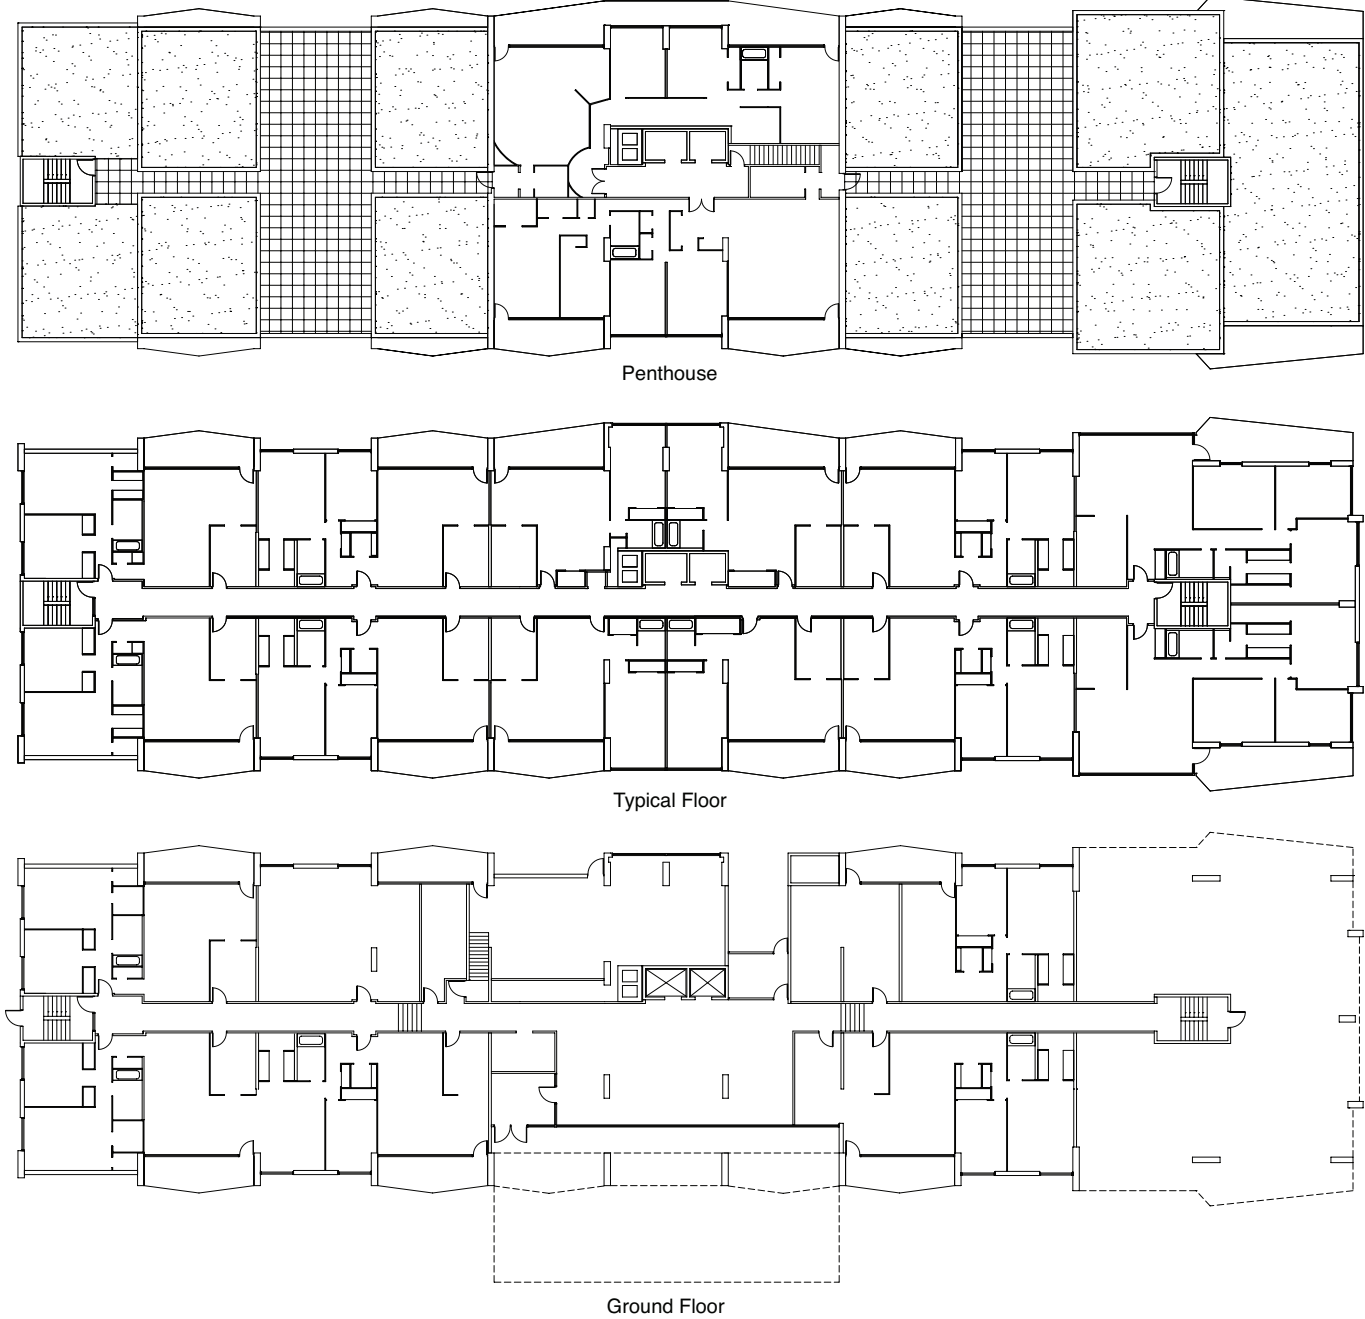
Floor plans of the archetype tower building indicate that tower buildings provided a diversity of apartment units suited to singles, couples and larger family households.
